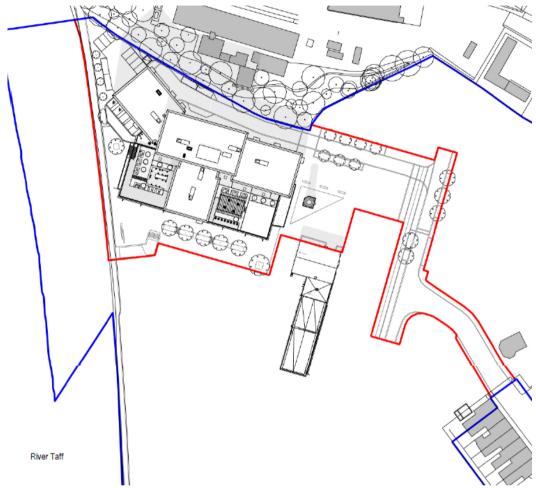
Internal site layout including 'Chimney Square' and 'Boulevard'
